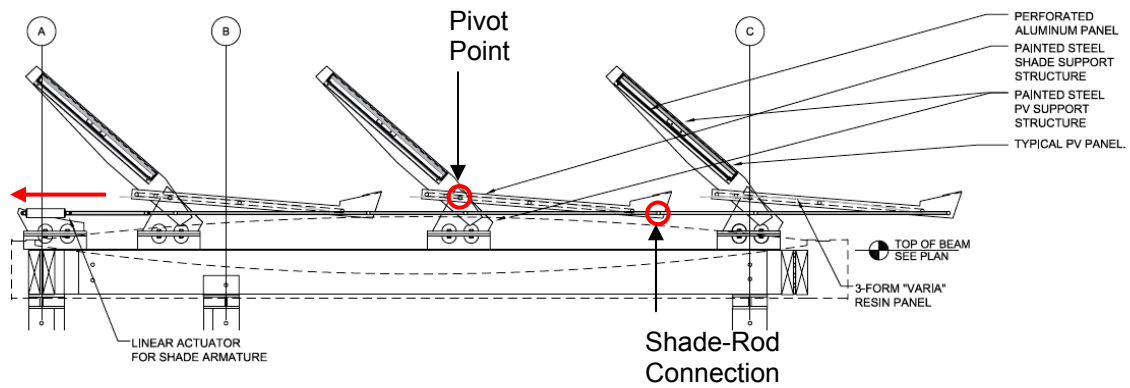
Typical section – shades in full extension (Fall, 2006).
